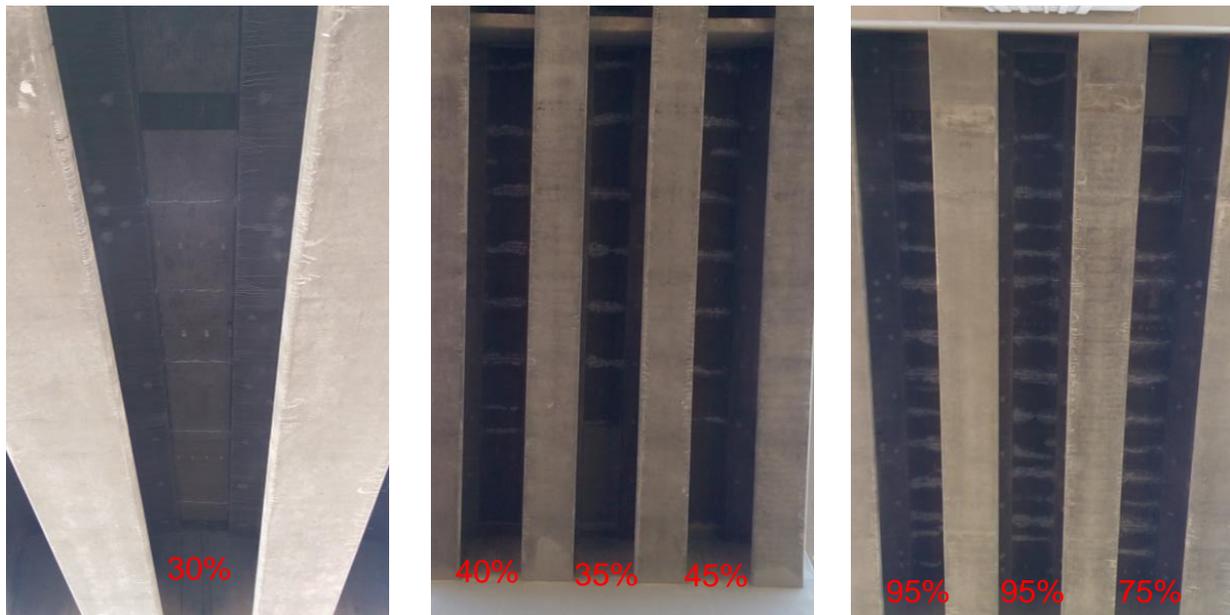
Range of Deck Cracking for Bridge 16/7S-E
